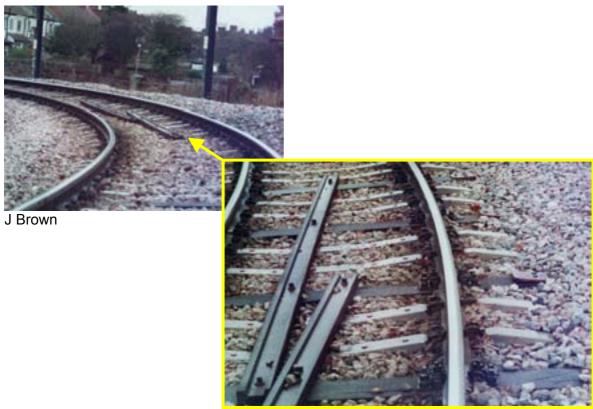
An example of ballasted track construction with S 49 rail, concrete sleepers and Vossloh Type W14 fastenings (12.02.04), Croydon Tramlink
